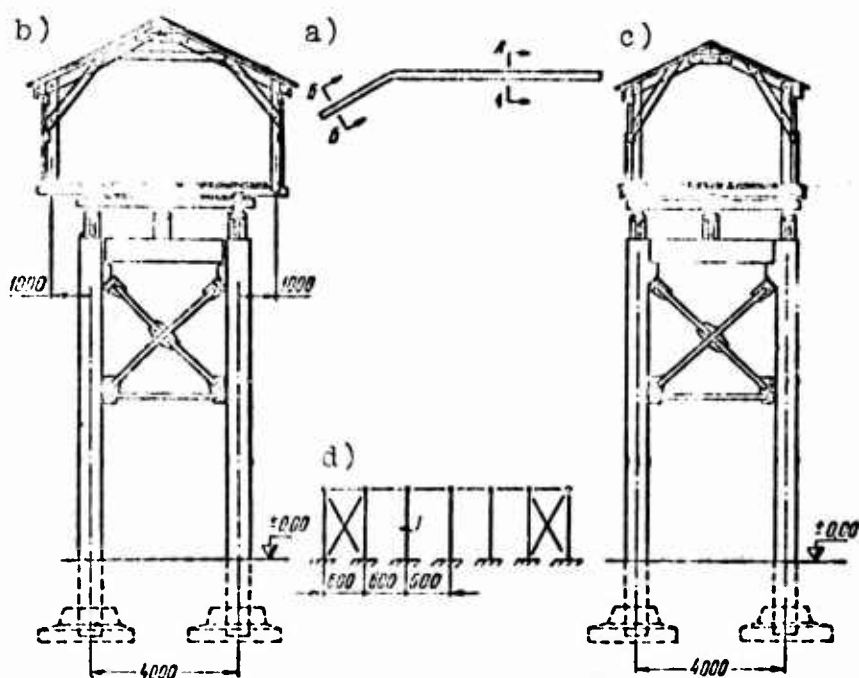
The haulage gallery of combined design different width: a) planning design; b) gallery at the widened section (section A-A); c) gallery at a width of 4 m (section B-B); d) profile design of a section of the lower structure.
